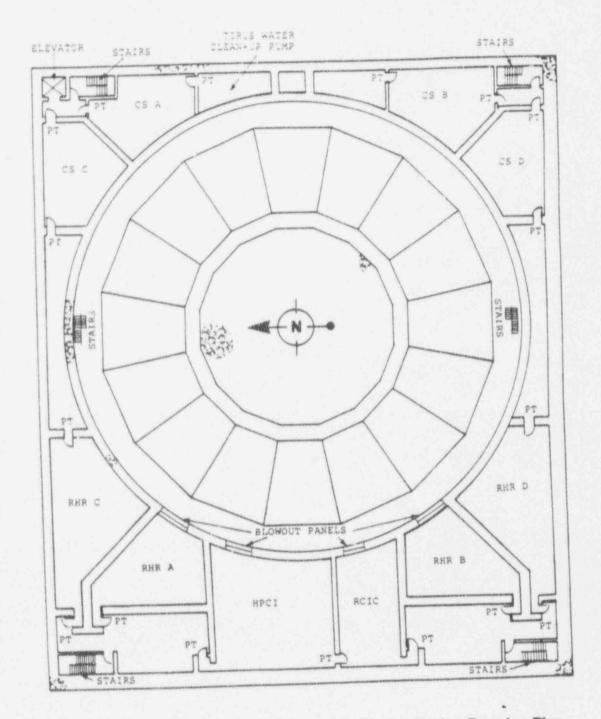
Reactor Building Shielding and Radiation Zoning Drawing Plan Elevation 54'-0"
